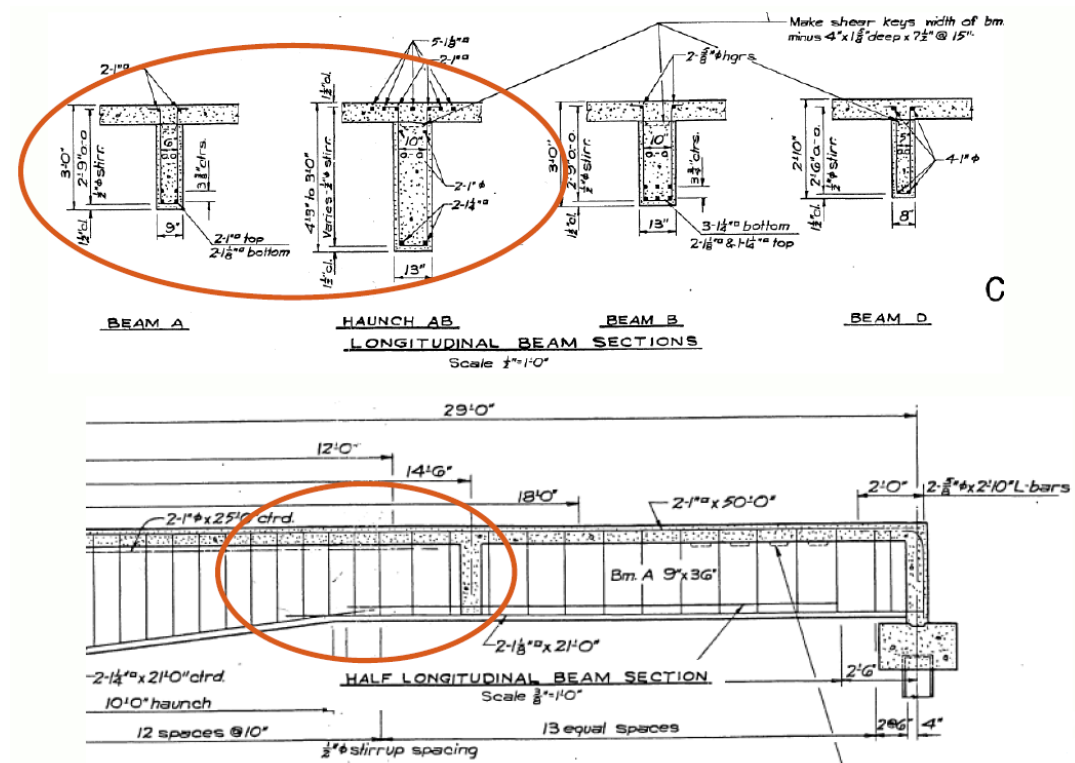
As-built Mosier Bridge construction plans (ODOT, 2013)
